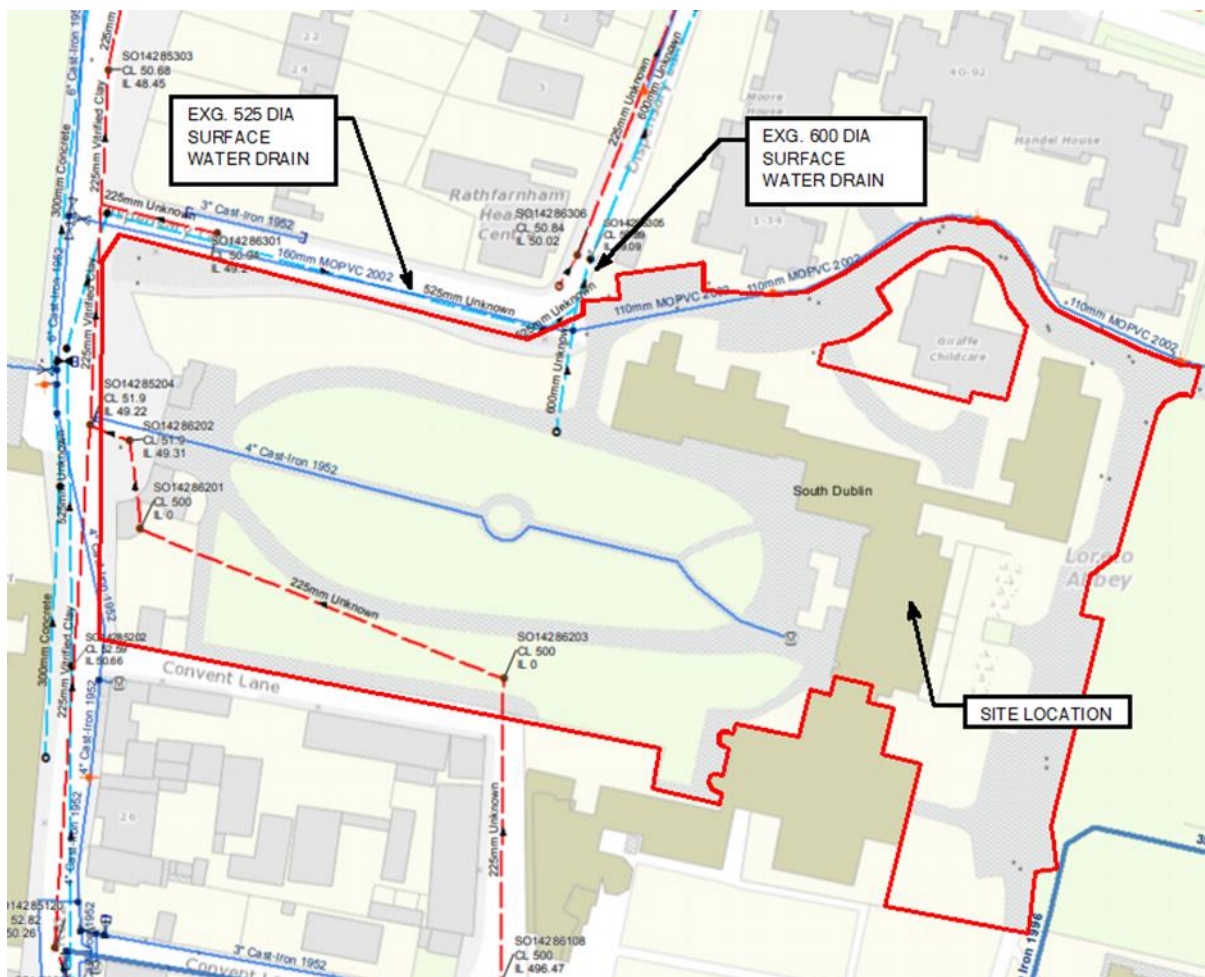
Extract from Irish Water Utility Plan (Site Boundary Indicative Only).
